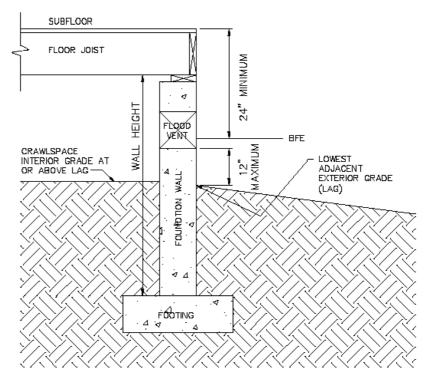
Below-grade Crawlspace Construction (Note: A belowgrade crawlspace shall be subject to higher flood insurance rates through the NFIP.)
